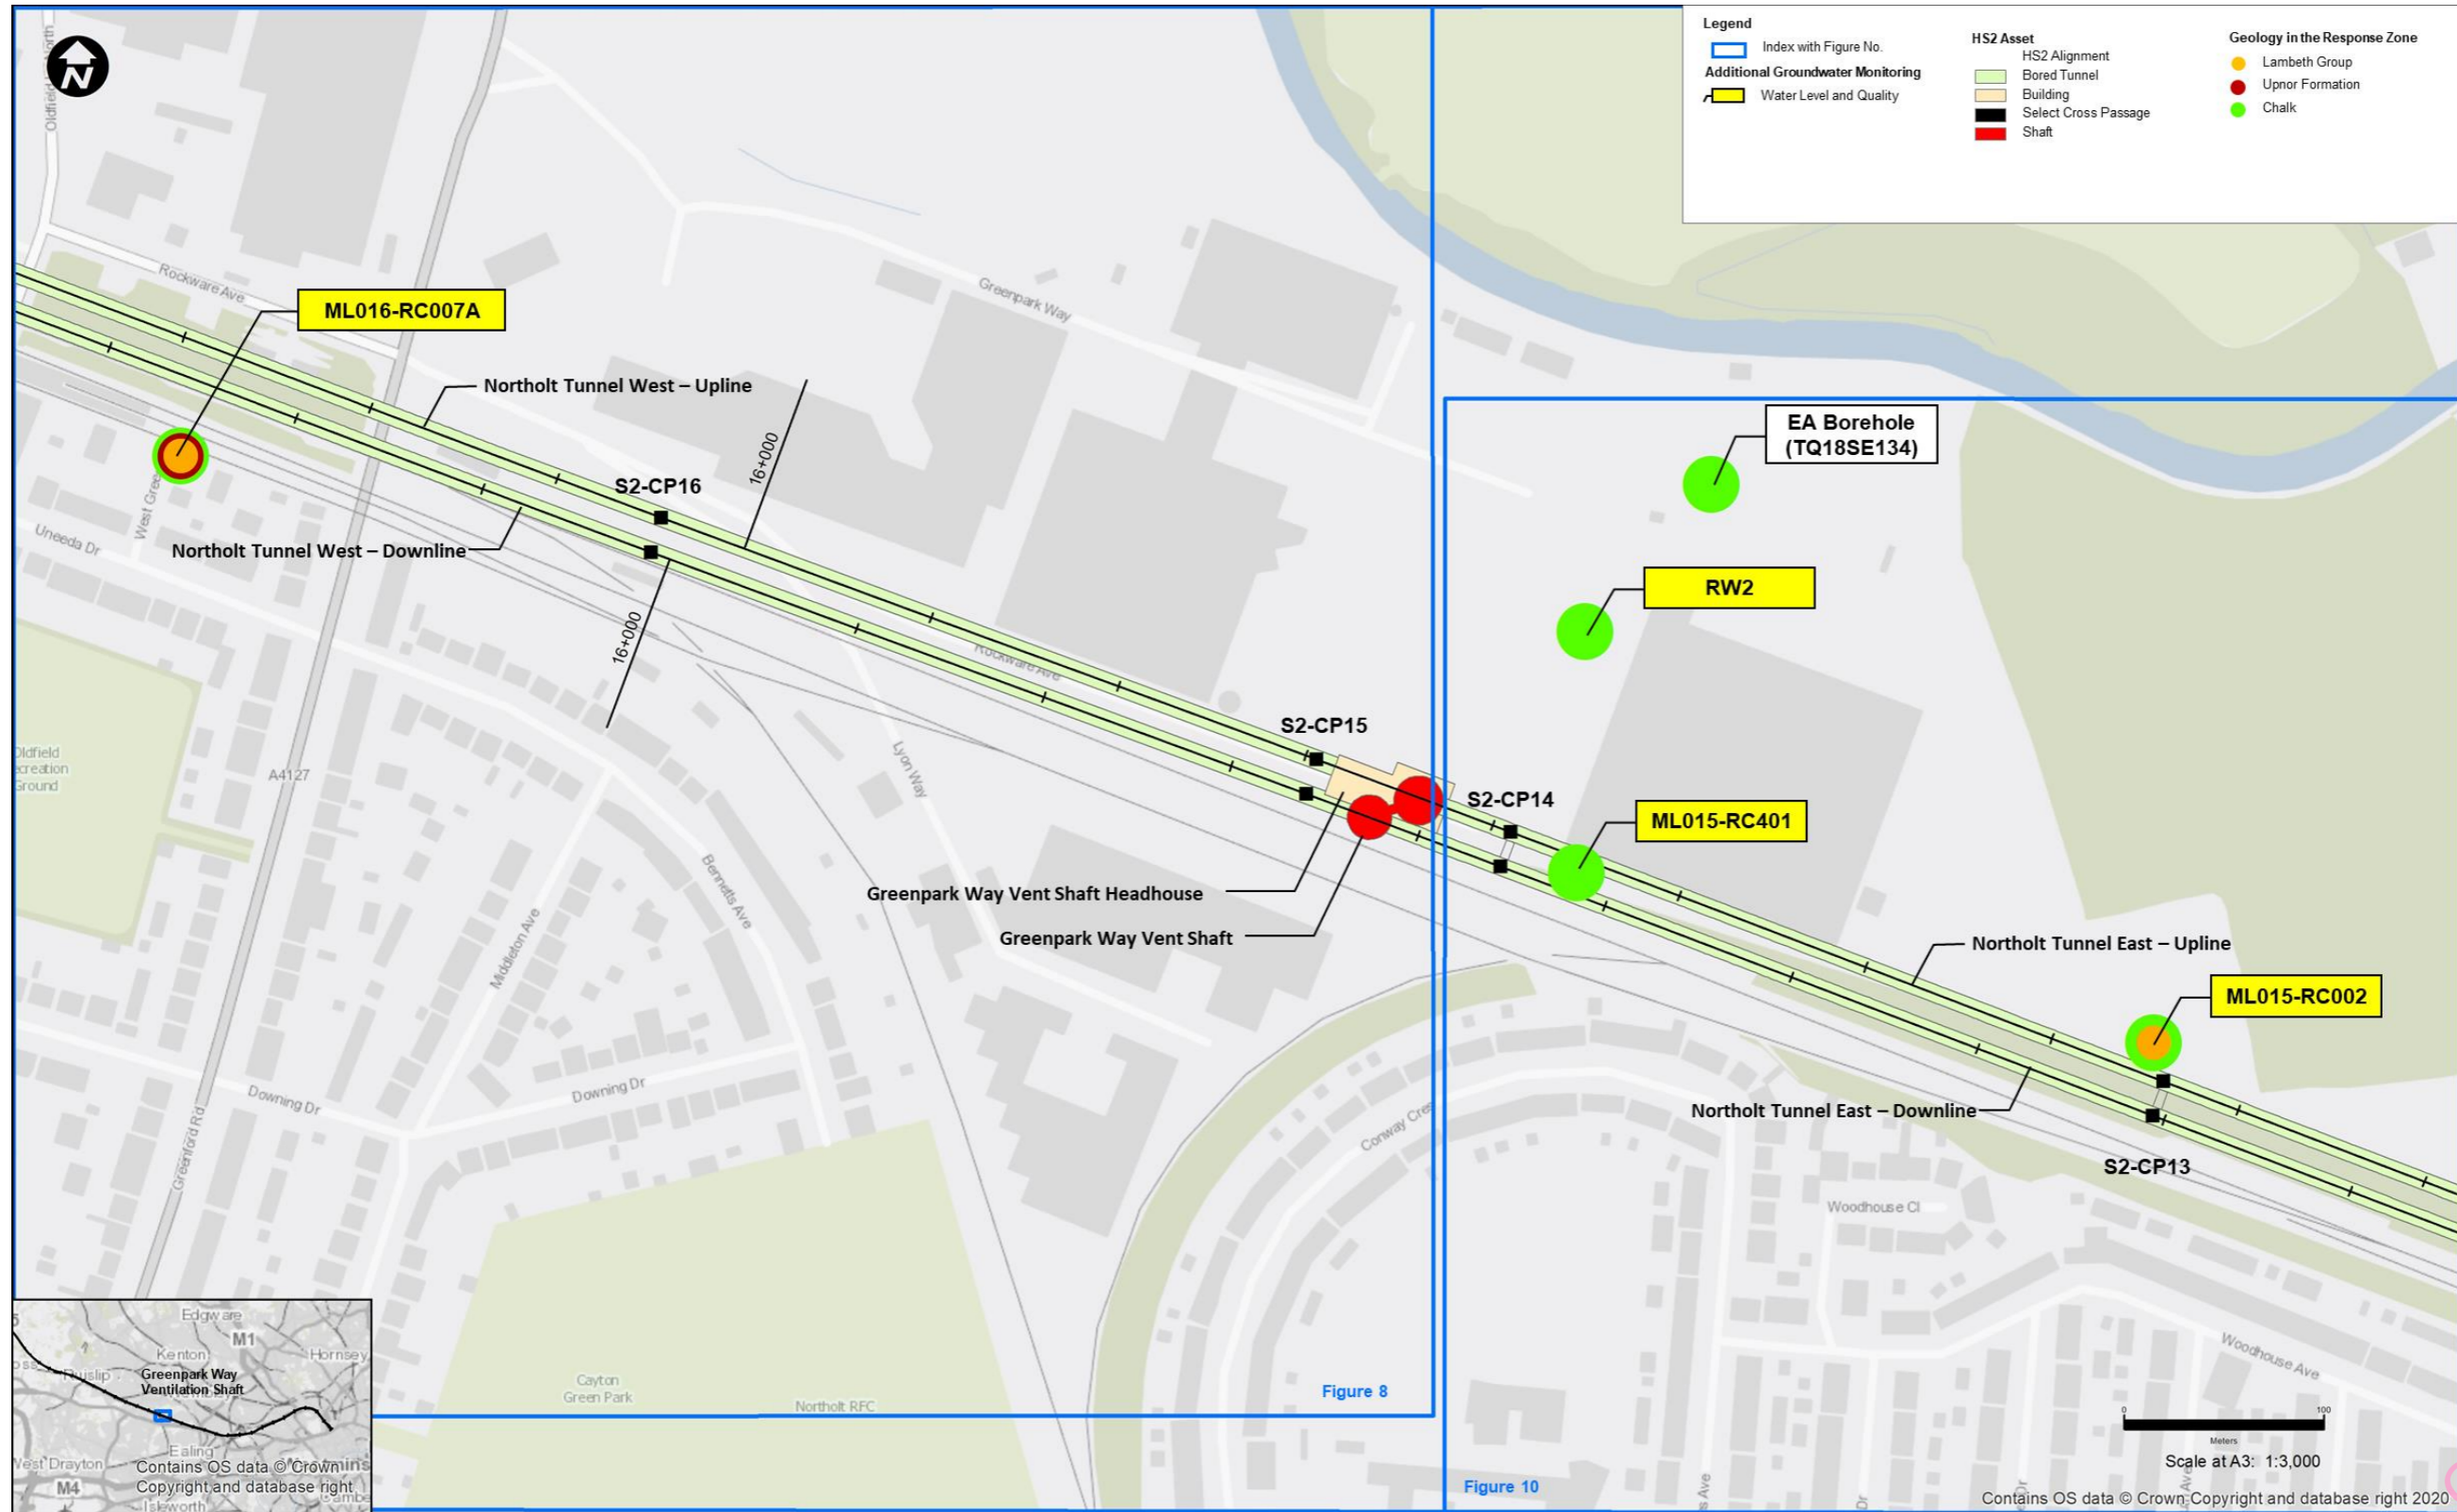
Groundwater Monitoring Plan - Greenpark Way Ventilation Shaft
